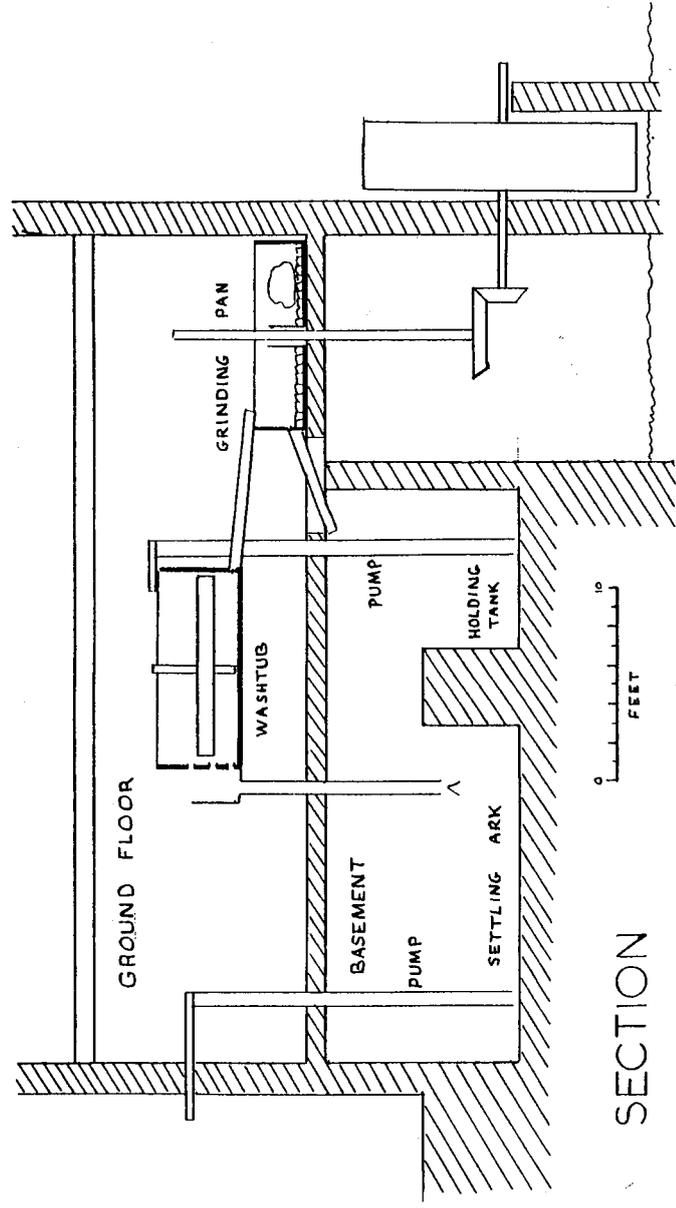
Section through Washford Mills showing the Ground Floor and Basement.
